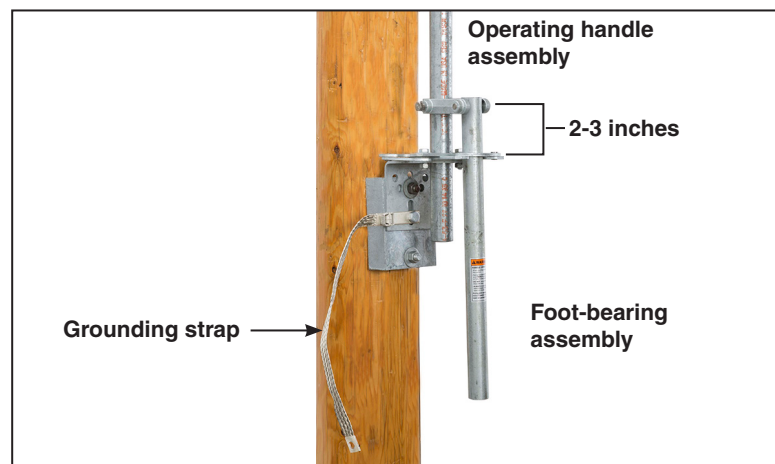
Install the foot-bearing assembly so the handle is two or three inches above the handle yoke.
